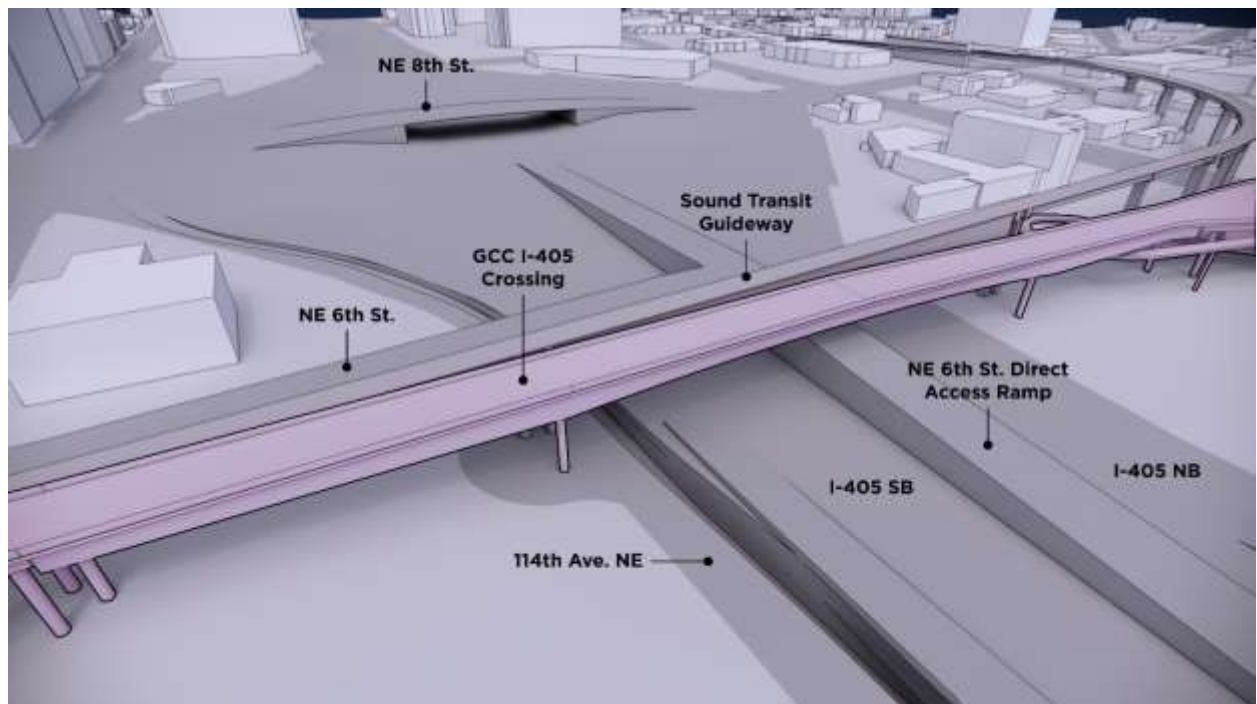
Conceptual rendering of the I-405 crossing structure, CIP PT box girder alternative (looking north).
